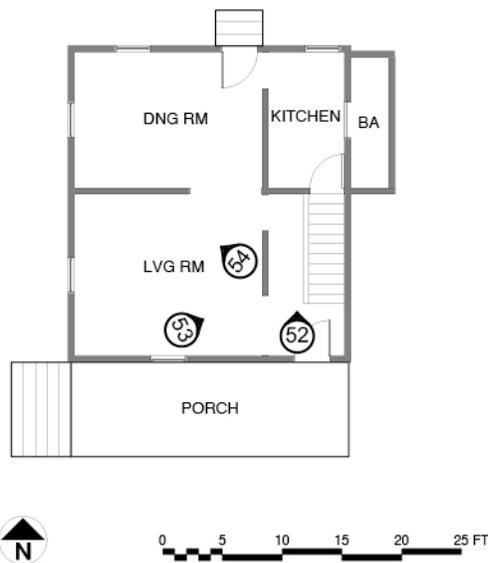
Figure U. Former 216 S. Evaline Street—Existing Conditions—First Floor Plan
